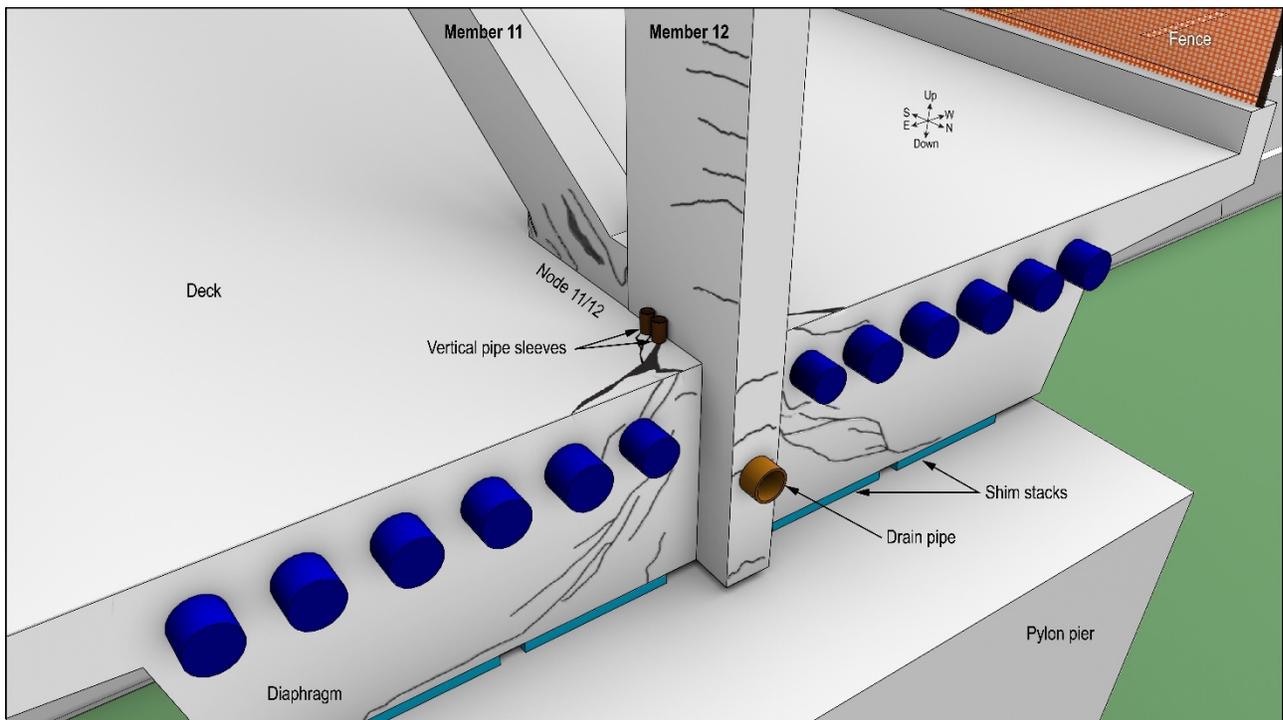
South and east view of extent of cracking at member 11/12 nodal region, deck, and diaphragm, indicating structural distress.
